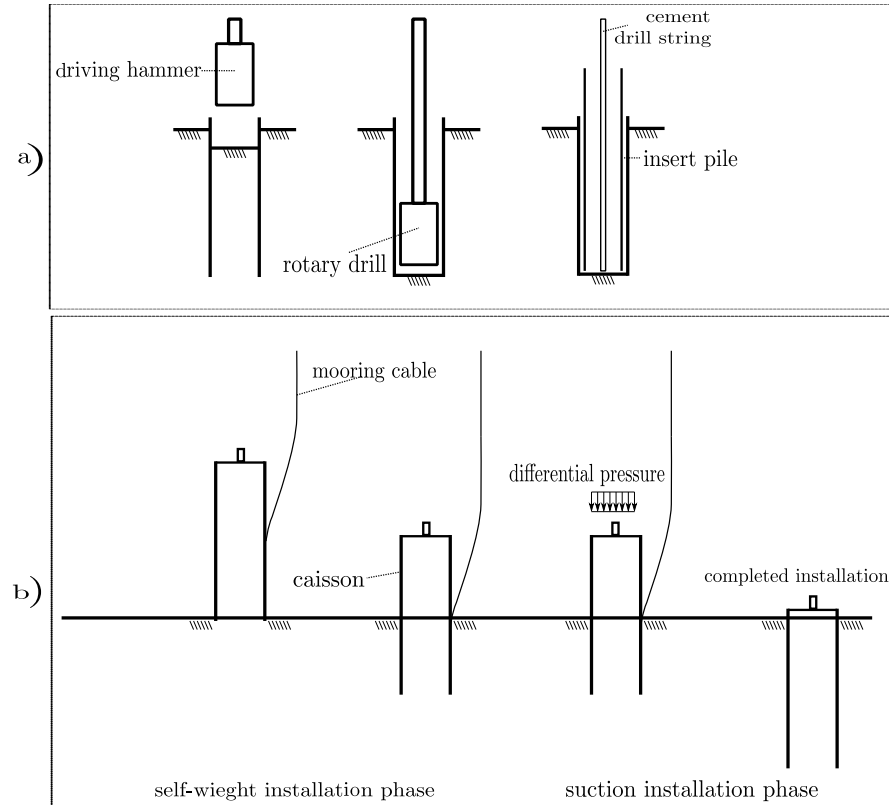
(a) Driven pile anchor; (b) suction pile anchor illustrations.
